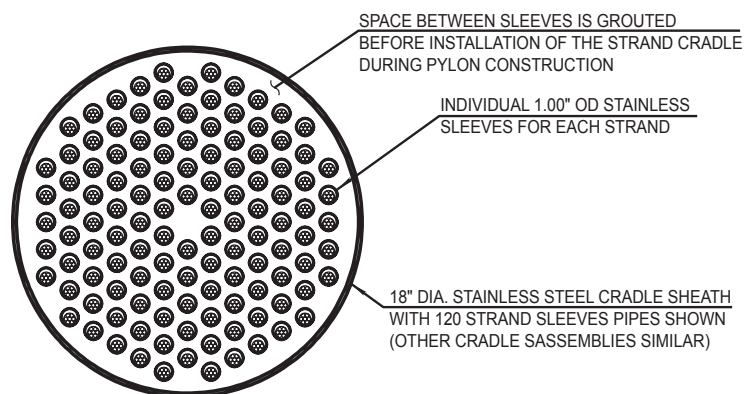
Within each cradle, sleeves separate the individual strands. All strands run parallel from deck level anchor to deck level anchor.
